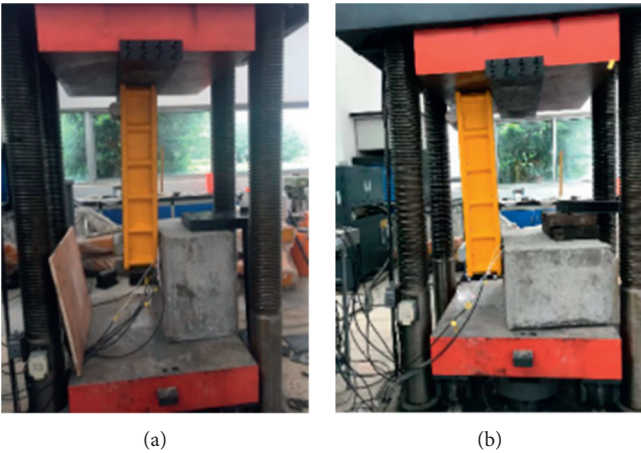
The built-in fitting for (a) plate-type and (b) slot-type.
